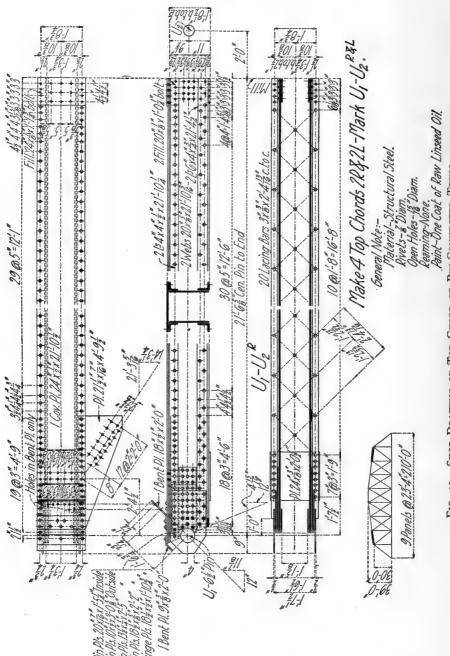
Shop Drawing of Top Chord of Pin-Connected Truss.
